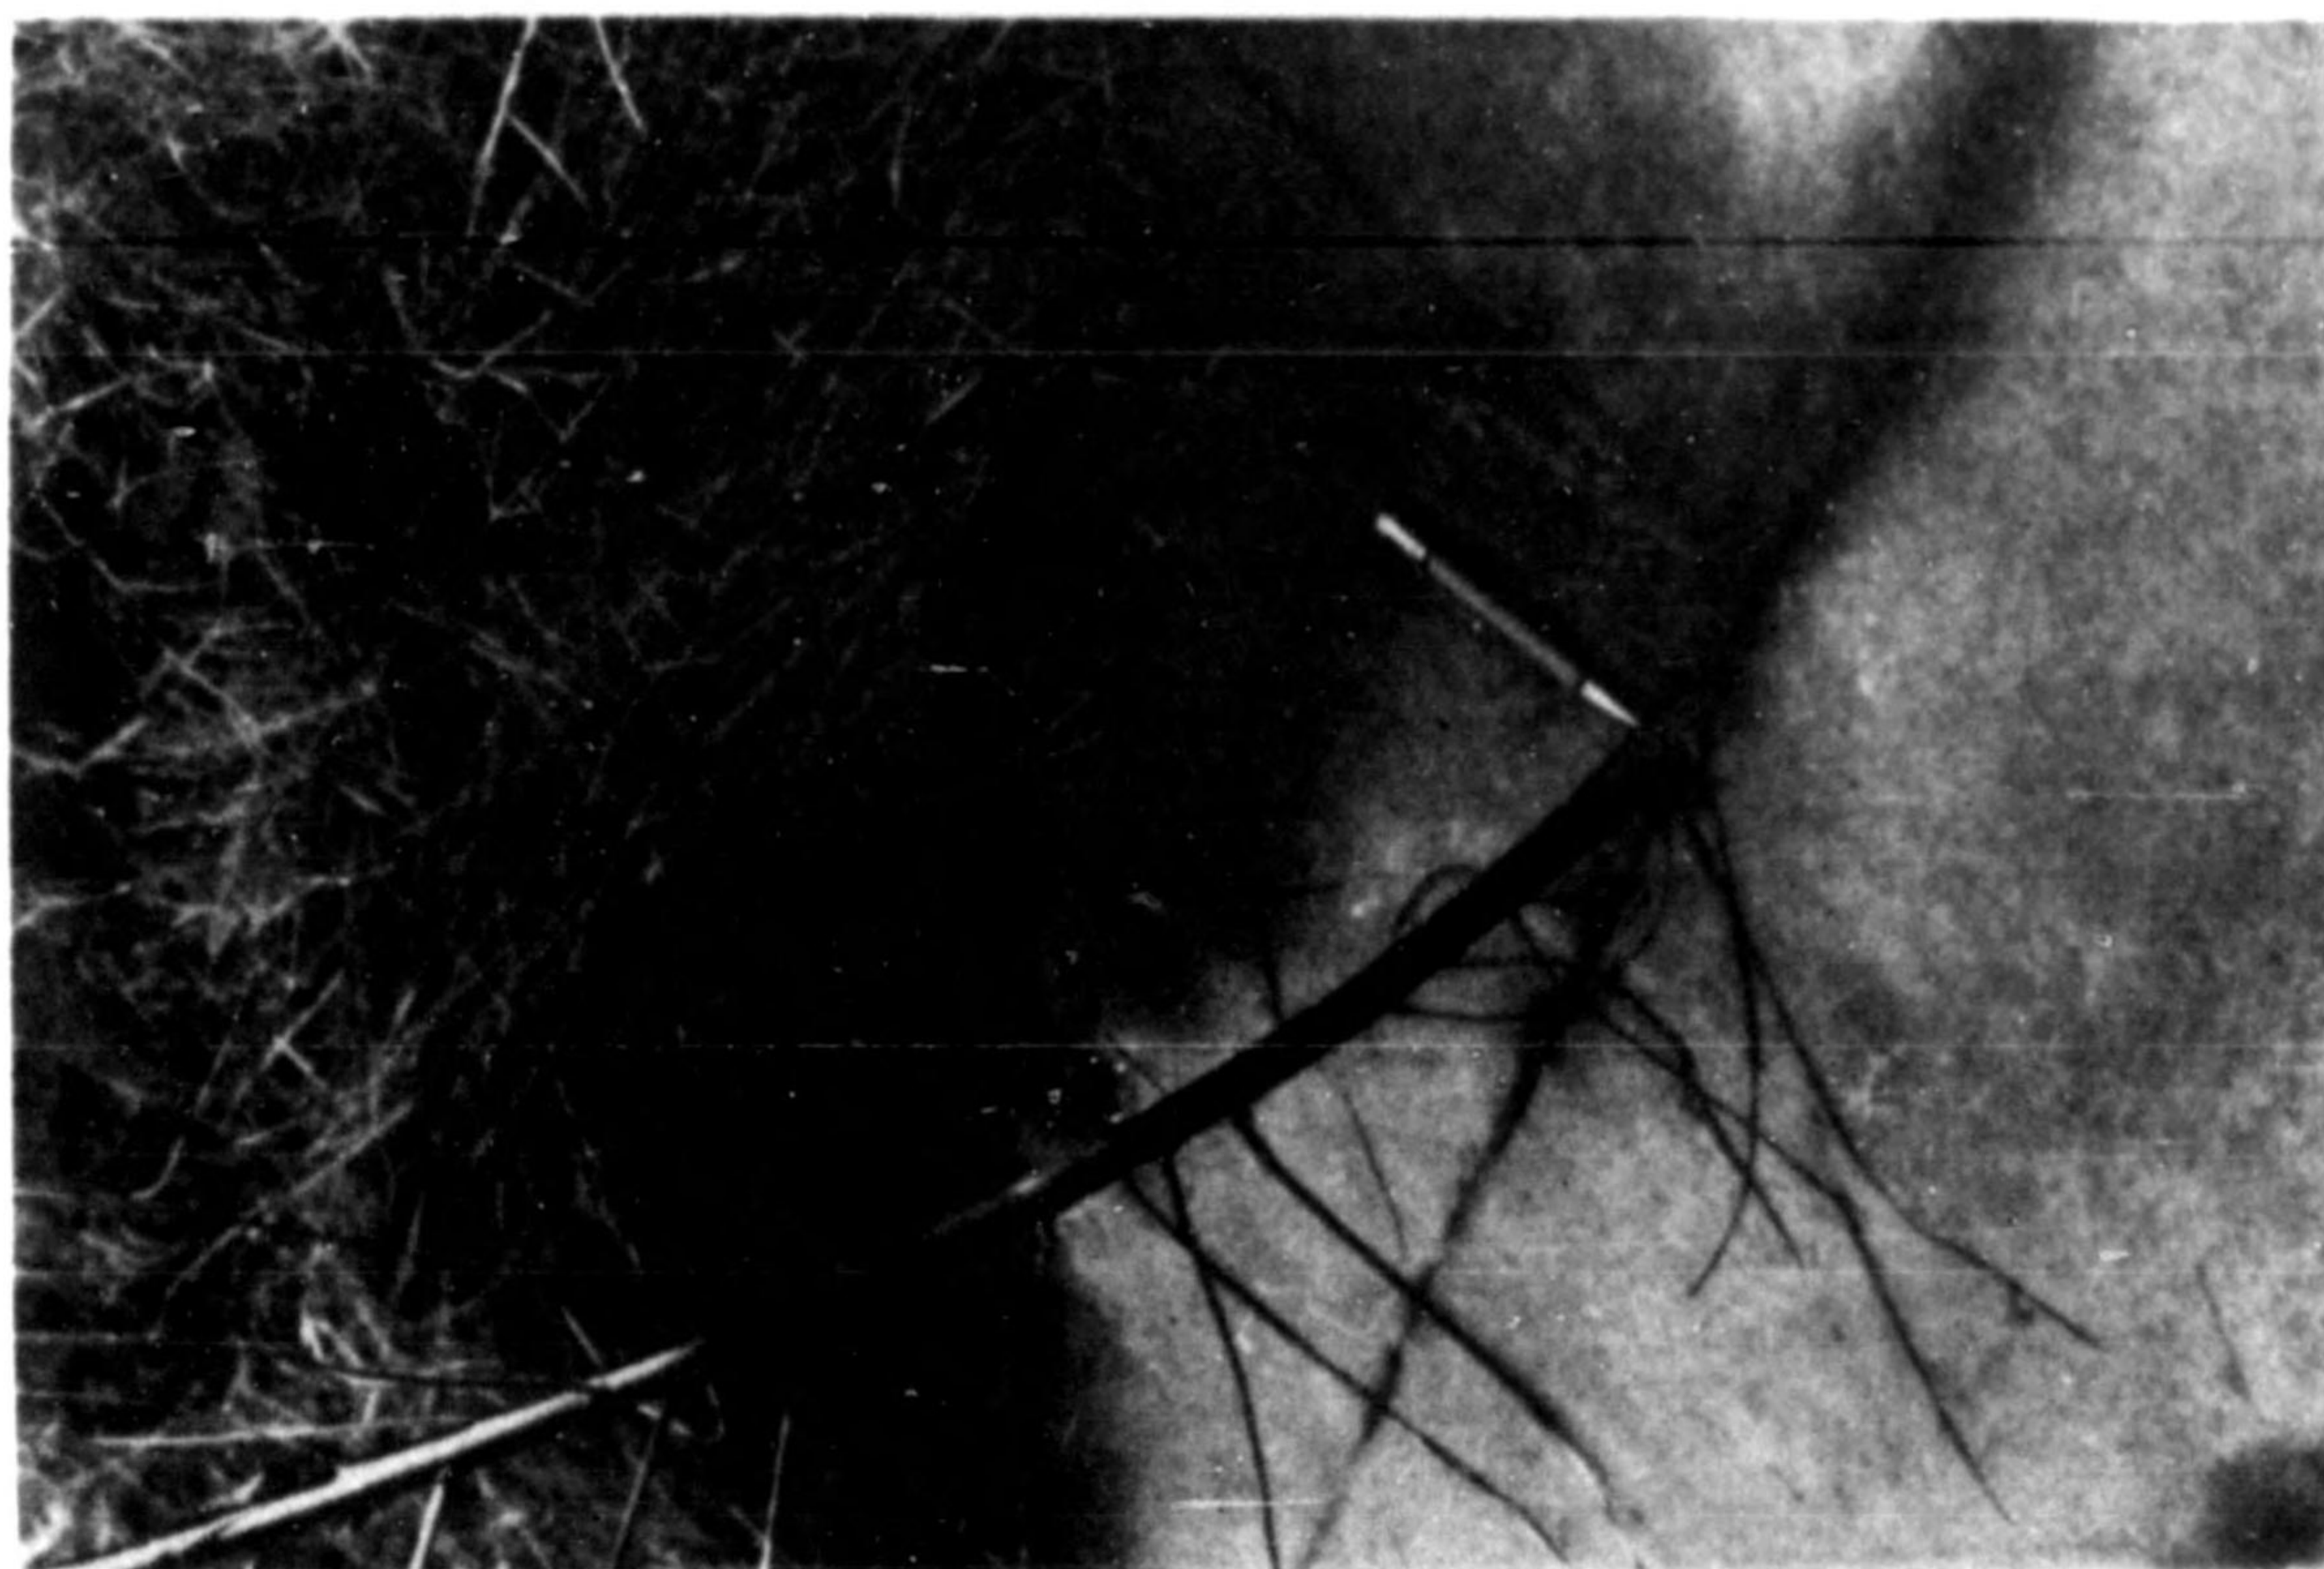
Young willow growing between the joints of butt-joint precast slabs.
